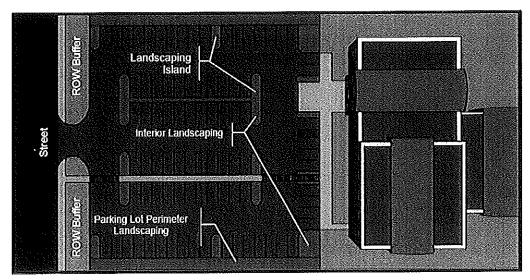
Island, Interior, and Perimeter Landscaping Plan View Illustration
